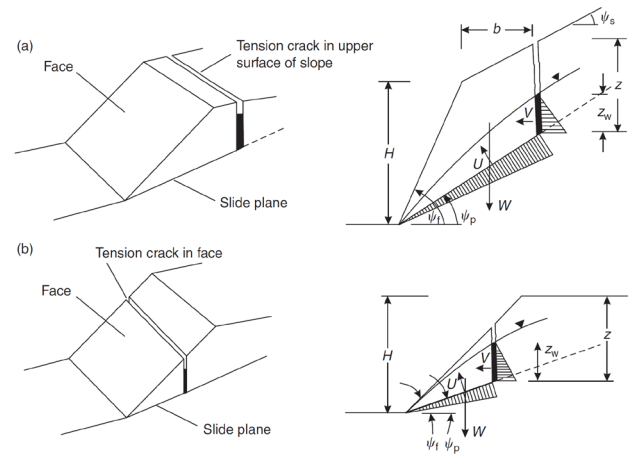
MECHANISTIC MODEL OF PLANE FAILURE WITH TENSION CRACK [19]
